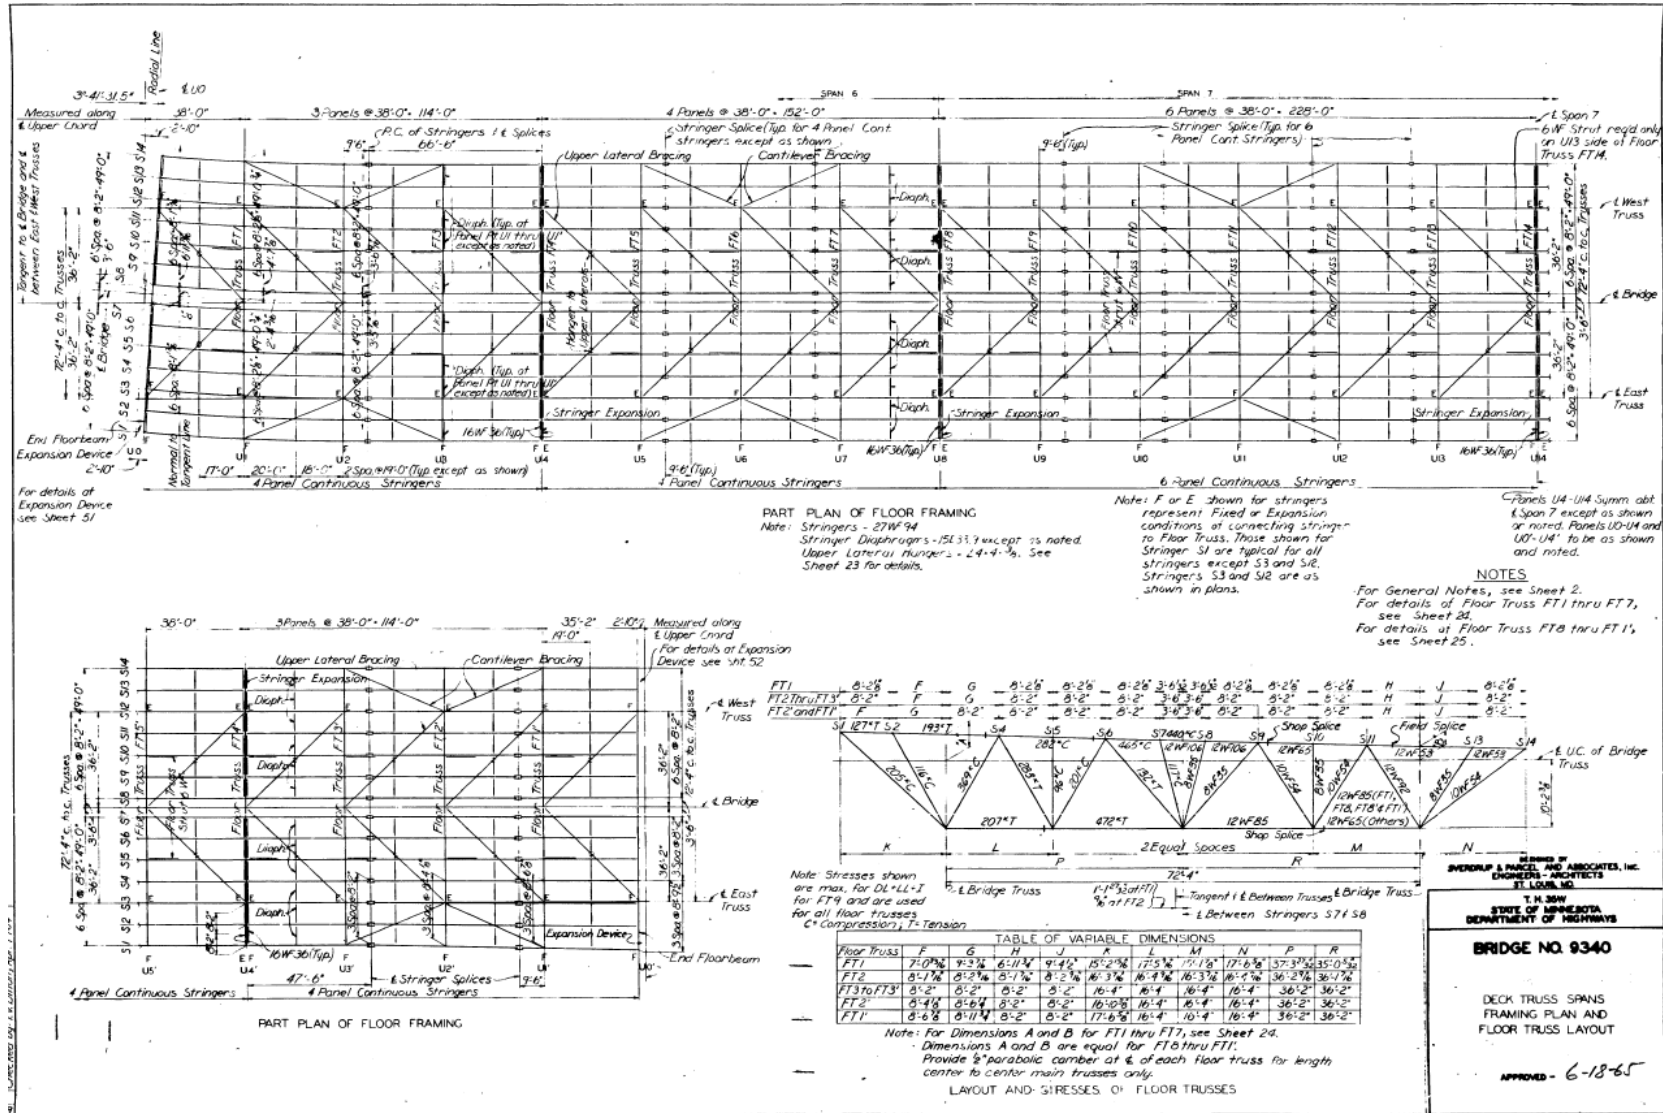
Dimensions of floor truss members. Sverdrup & Parcel and Associates, Inc. (1965). State of Minnesota Department of Highway Construction Plan for Bridge No. 9340 – Balance of Bridge and Approaches. St. Louis, MO. Used under fair use, 2015.
